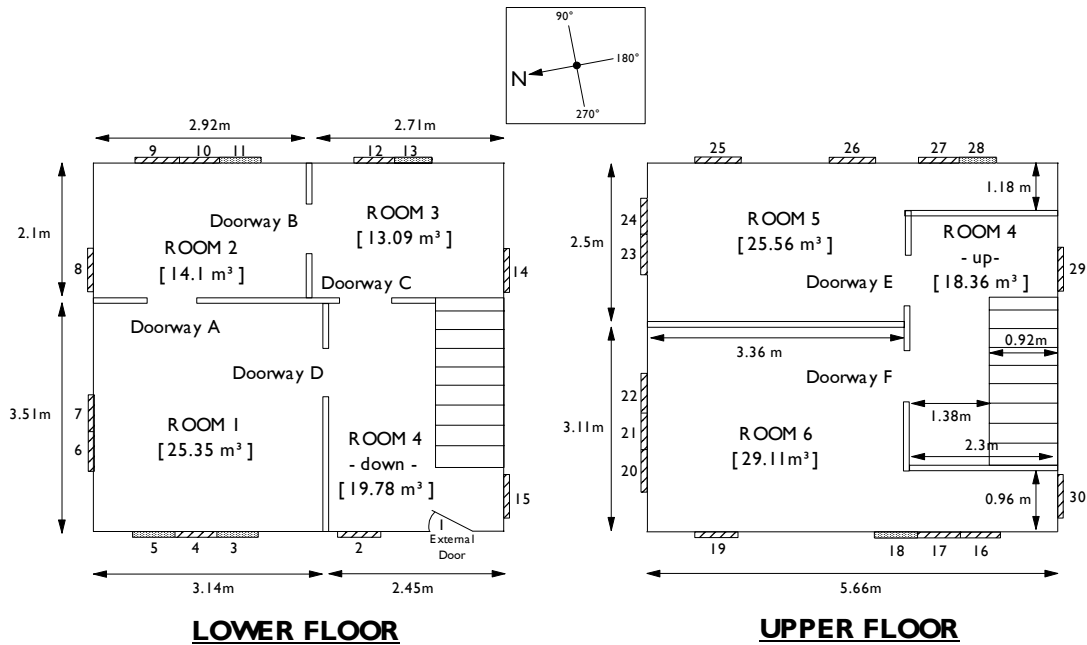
Plan of The Floors with Dimensions and Nomenclature of the Facility
